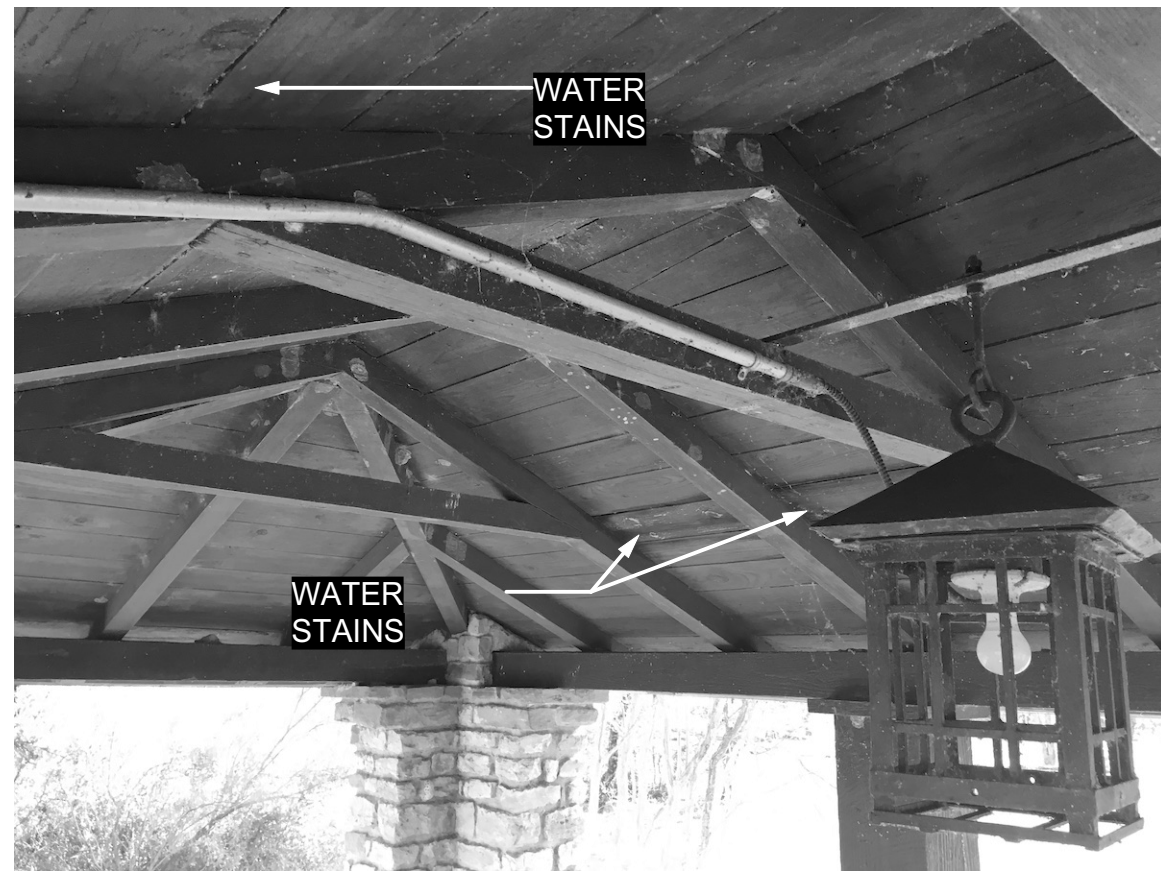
WATER STAINS UNDERSIDE OF ROOF
